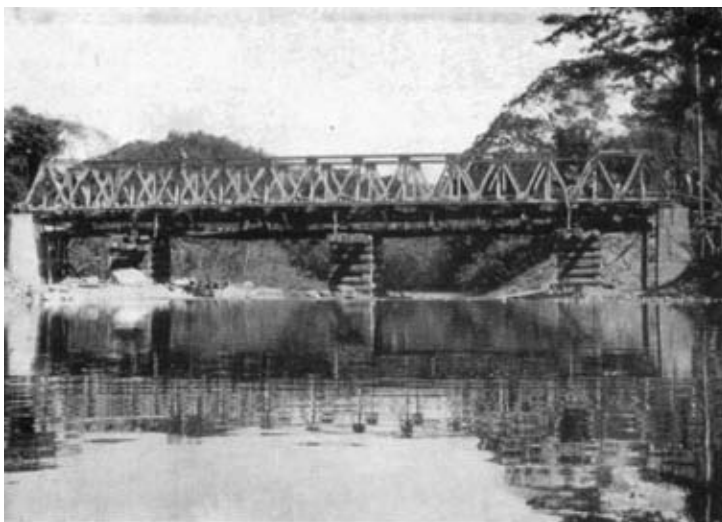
Sibun Bridge under construction, showing the 140-ft. Callendar Hamilton being erected on a staging formed of the temporary log bridge. Two additional standard spans were added to complete the bridge.
